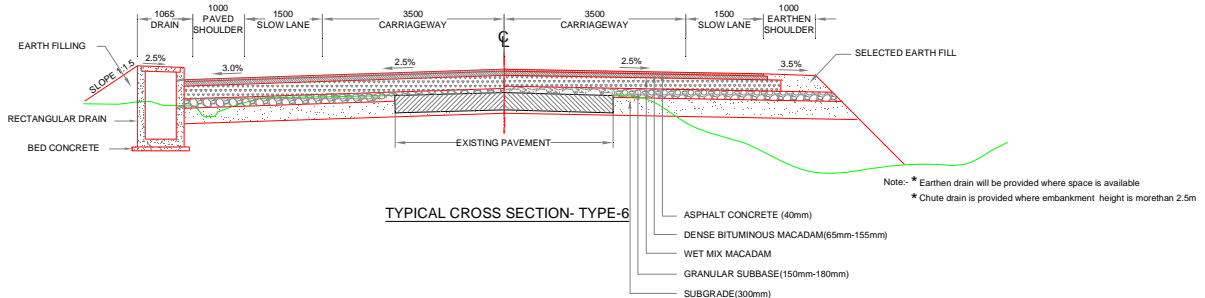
TYPICAL CROSS SECTION- TYPE-6
